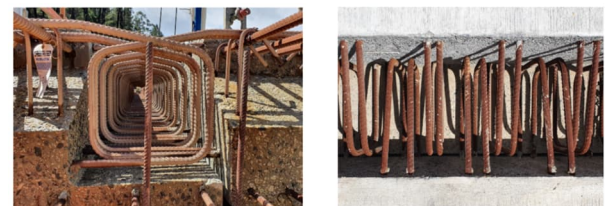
Overlapping transverse reinforcement in section and plan view installed on site
